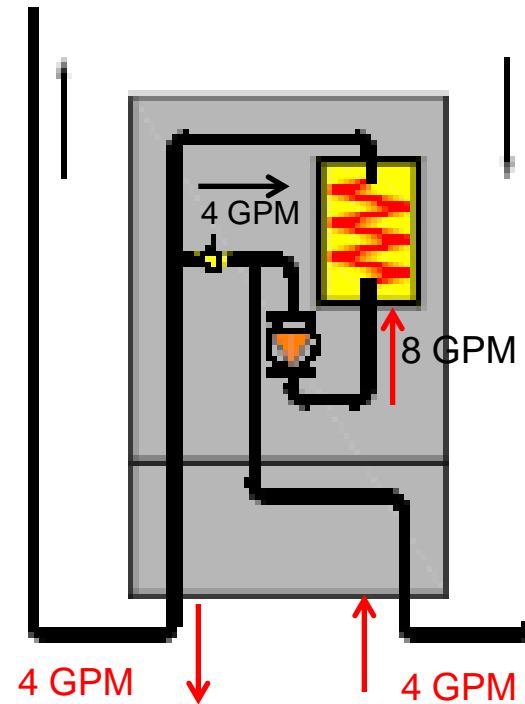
Single Boiler Two-Pipe Zoned System With Zone Pumps
